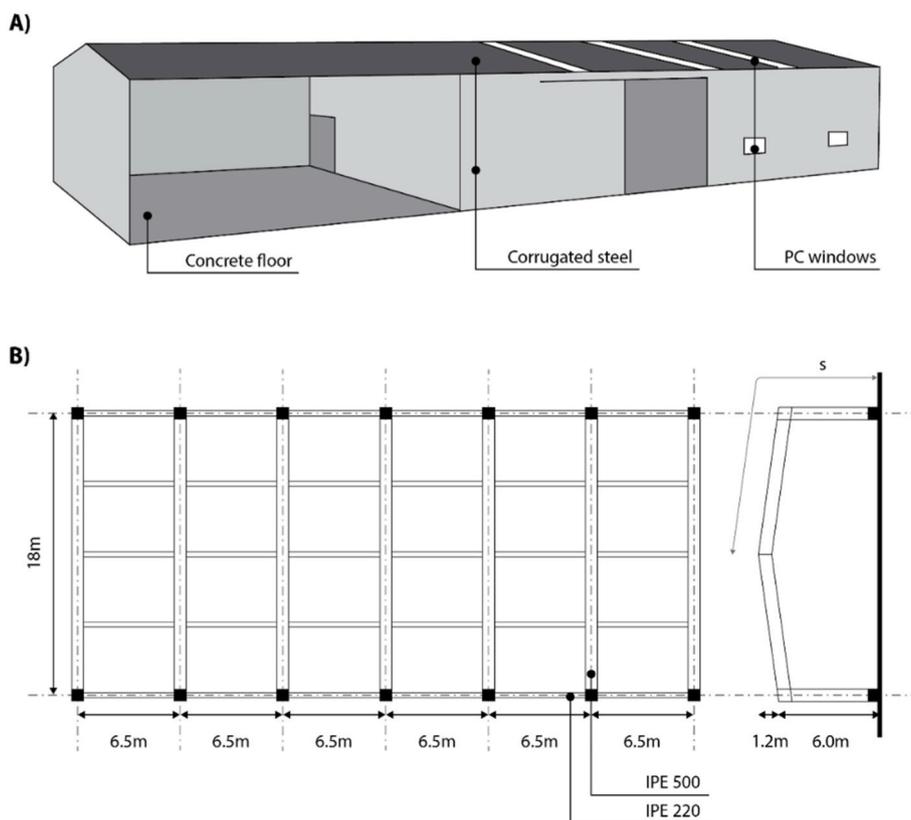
A) 3D model of one of two 700 m² agricultural buildings used in the theoretical model. B) Typical structural arrangement of the agricultural building using a steel columns and beams.
